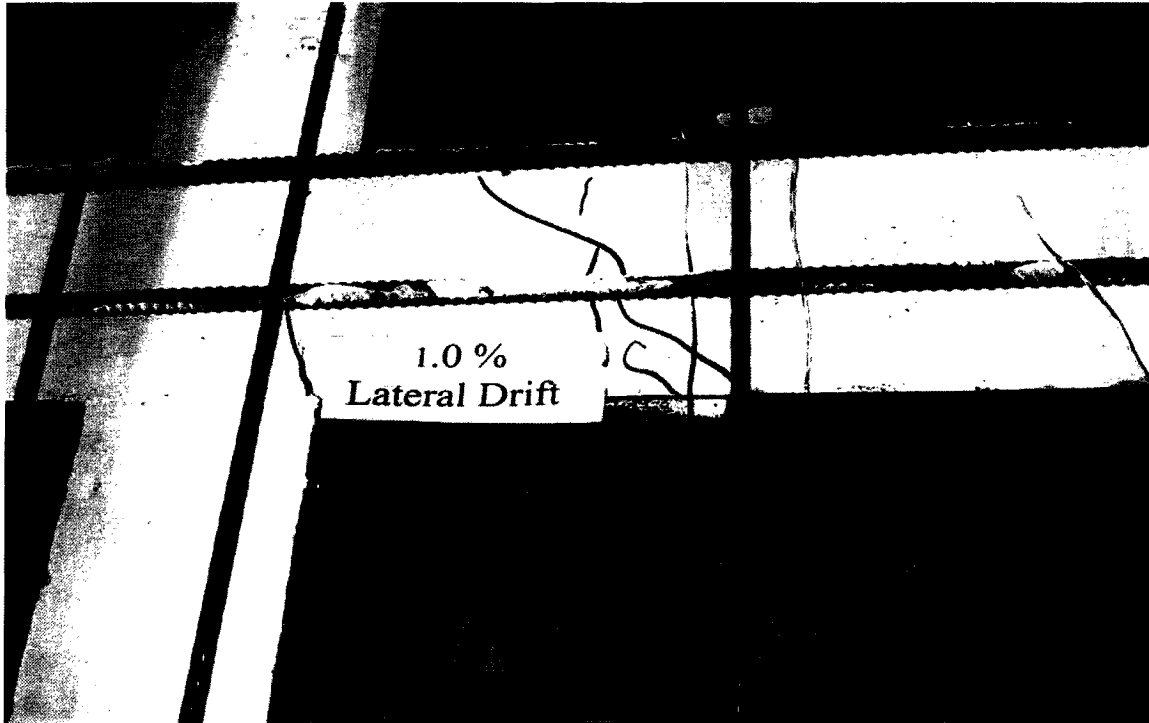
Widening of beam flexural cracks at 1.0 % lateral drift (BR-1)
